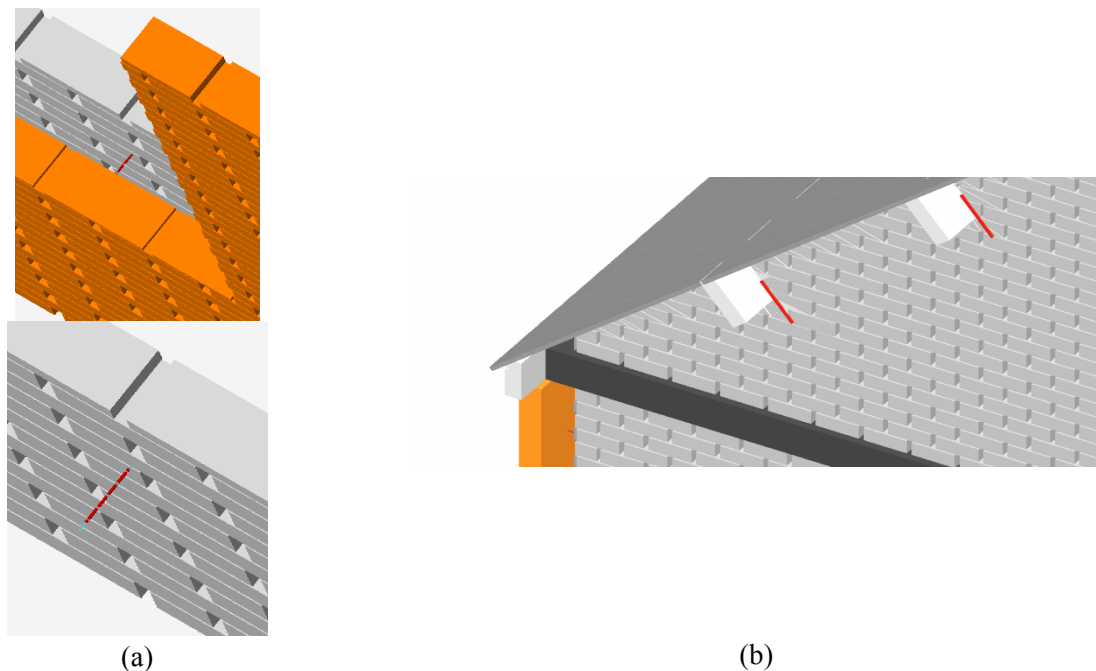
Nails connections of EUC-BUILD1 (a) and L-shaped anchors of LNEC-BUILD1 (b)
